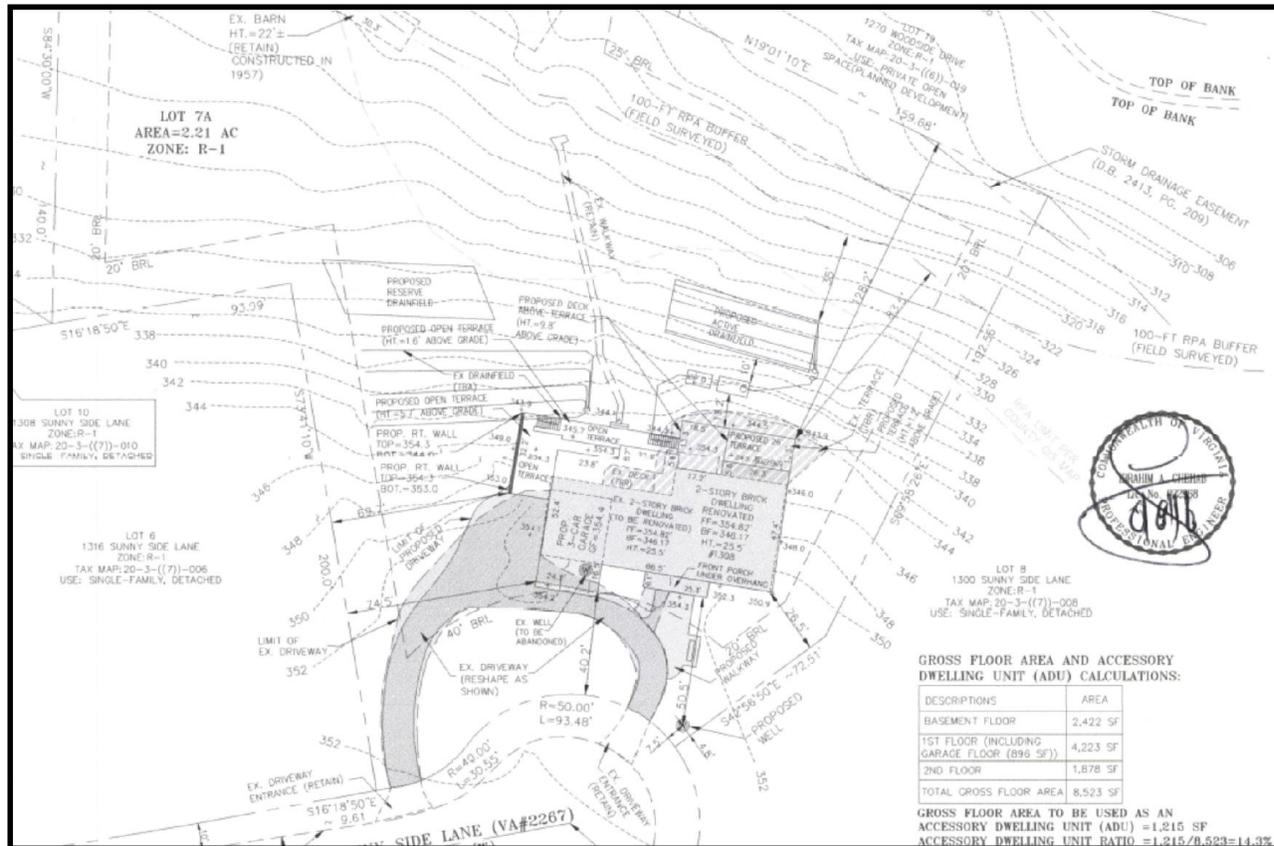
Special Permit plat, partial, showing all existing/under construction improvements on the subject property. Source: Applicant.
